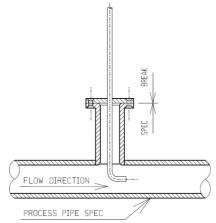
Schematic of the Chemical Injection, Flanged Type.
